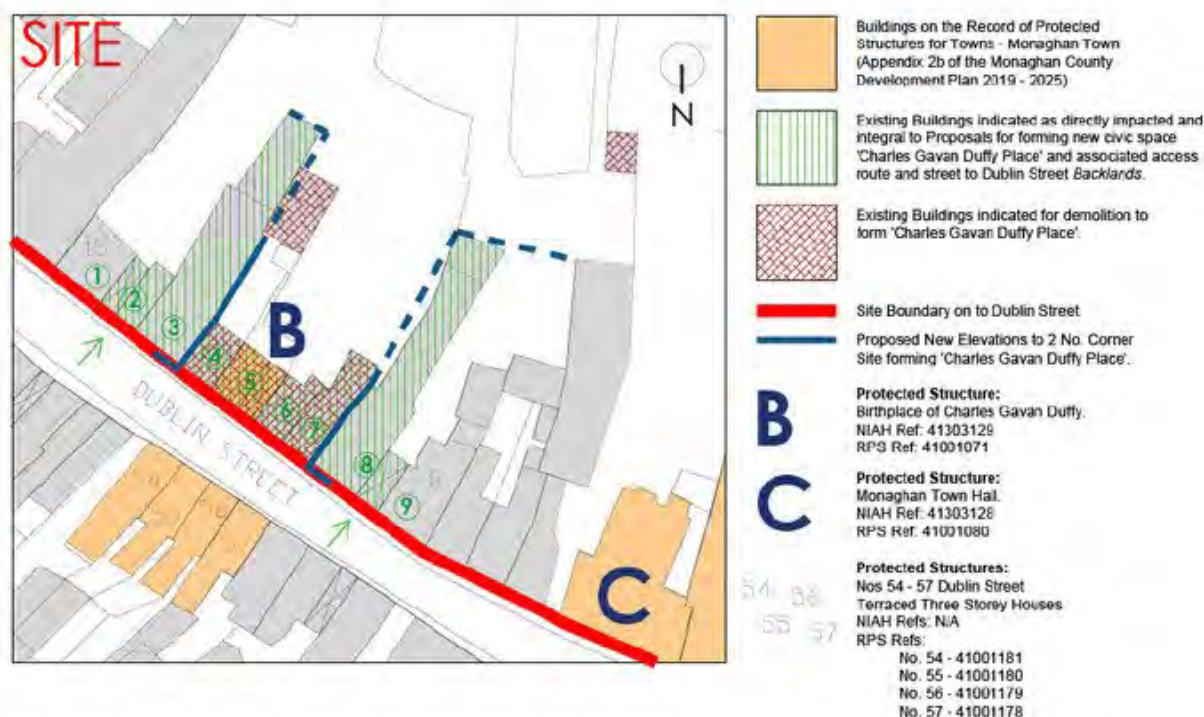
Existing Plan – Site Review. Consarc Design Group.
